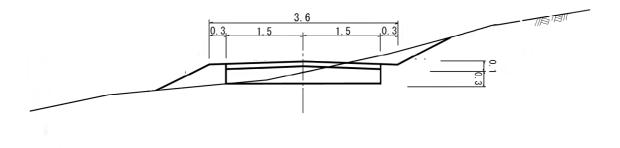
Standard Drawing of Operation Road (unit: m)
